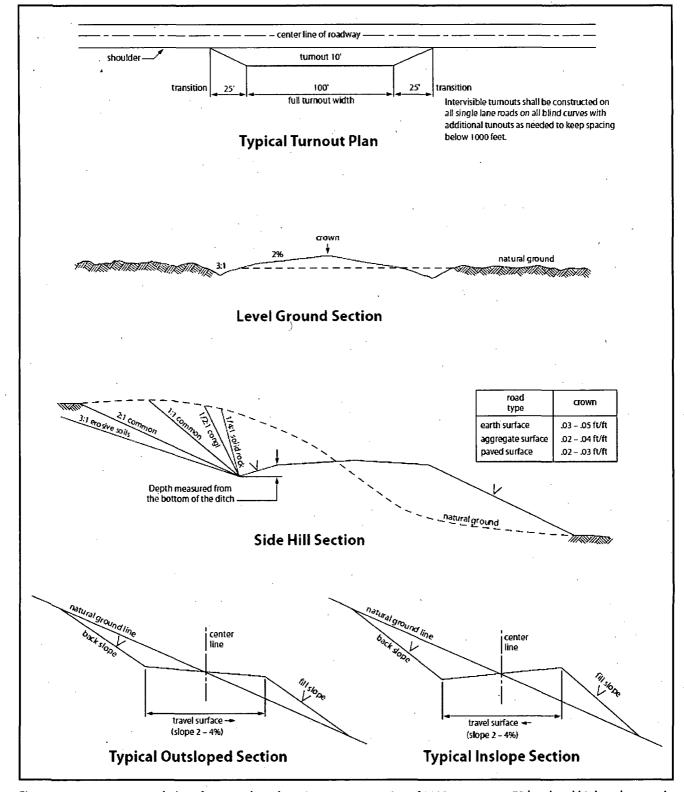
Cross-sections and plans for typical road sections representative of BLM resource or FS local and higher-class roads.
